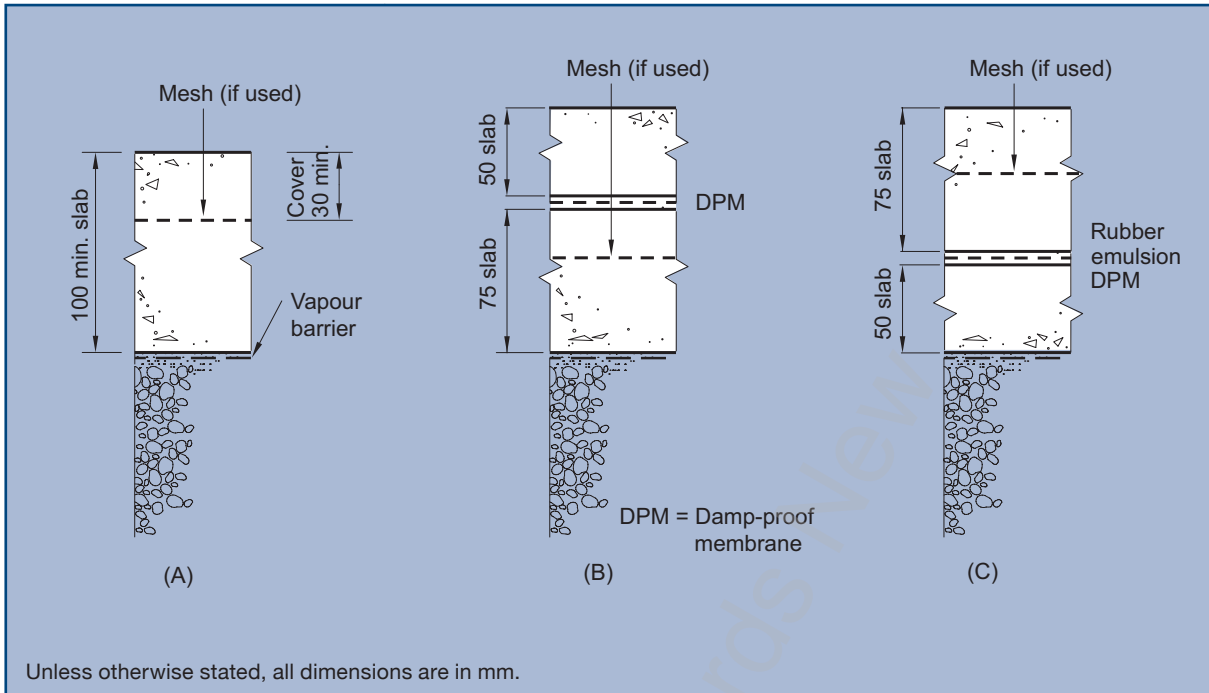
Construction of ground slabs (see 7.5.8.2)
